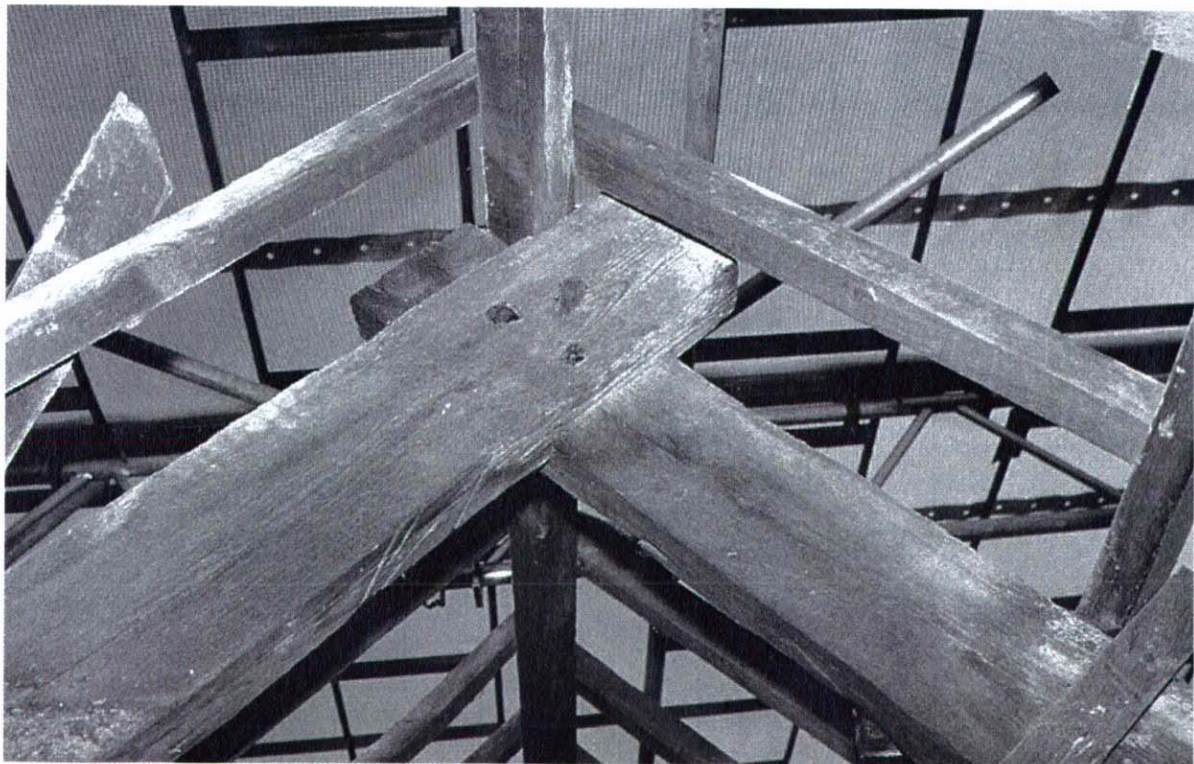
Roof structure (apex detail). Use of both wooden peg and wrought-iron nails.
